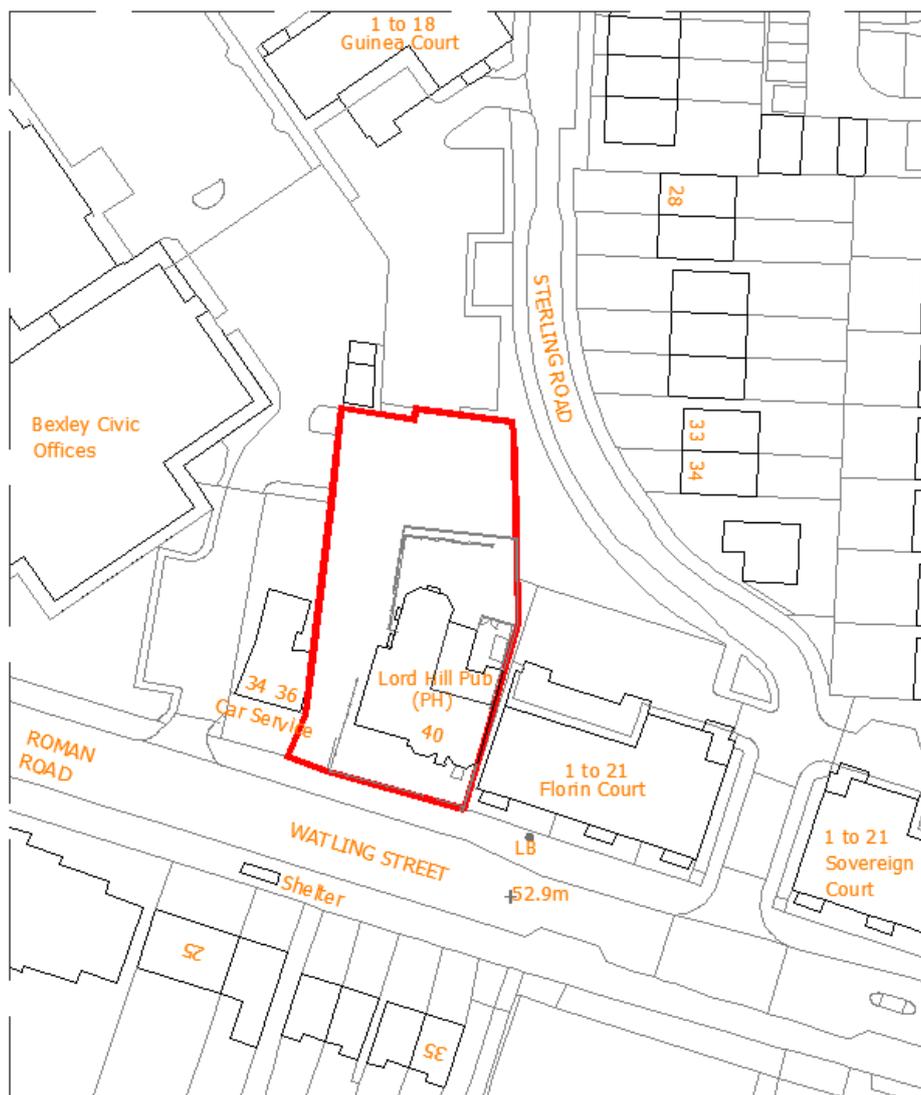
Site Plan of The Rear of the Lord Hill Pub, Bexleyheath
